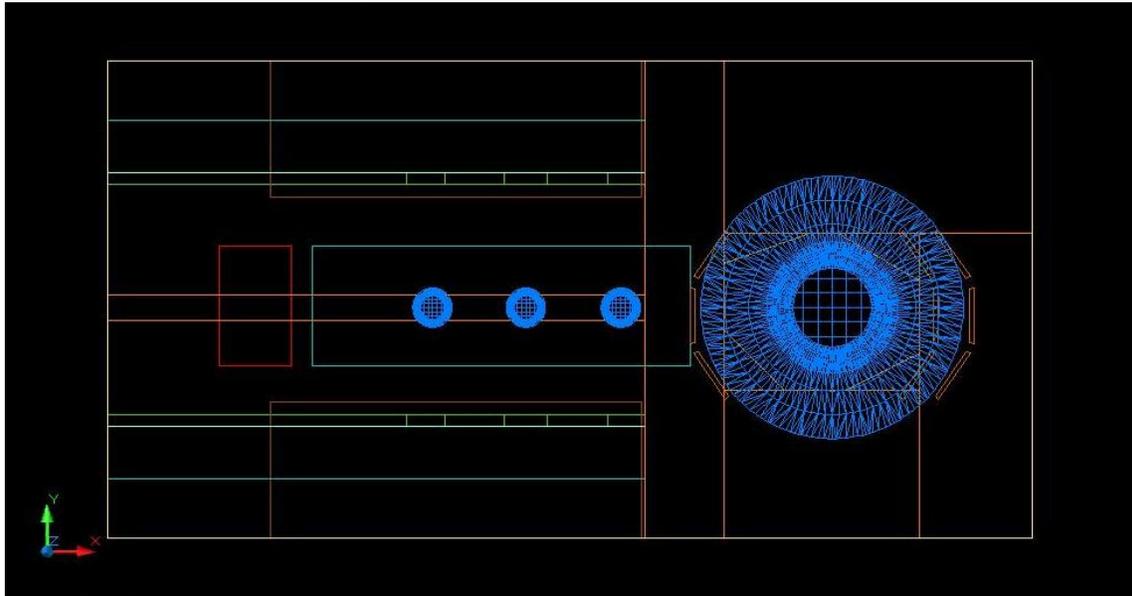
Plan of the CEPA Shopping Center as modeled in AutoCAD .
